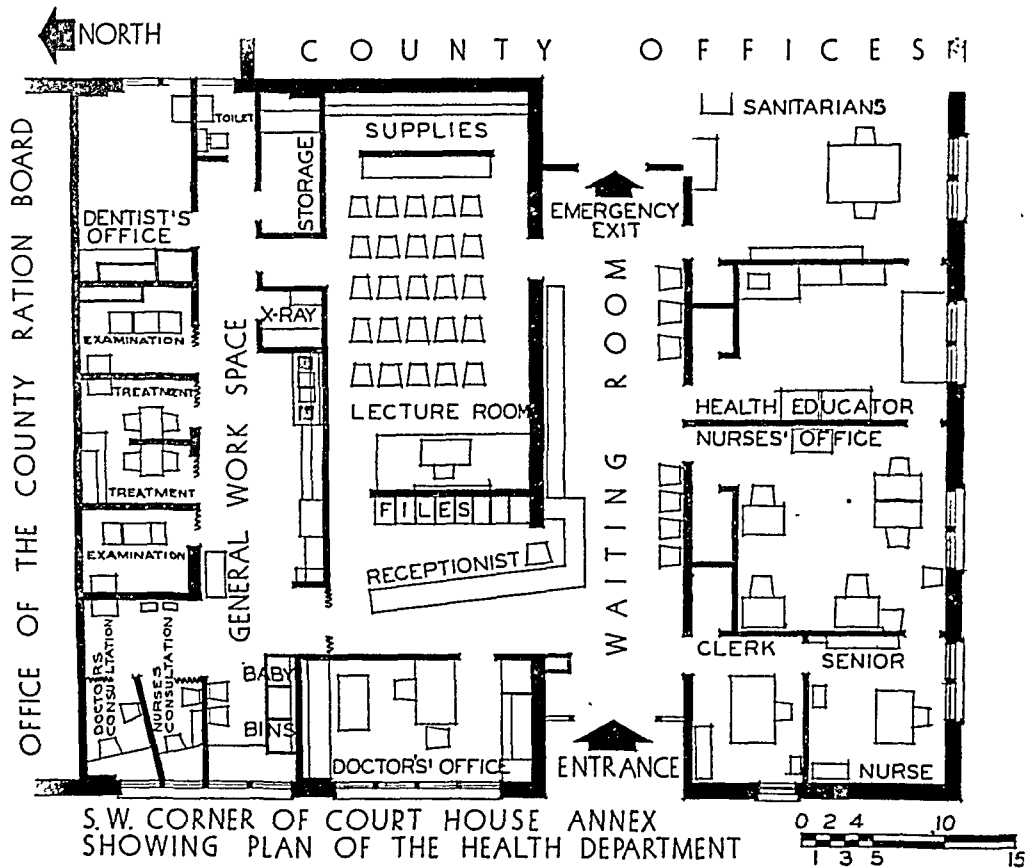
Floor plan. South of waiting room original quarters. North of waiting room newly converted space.
